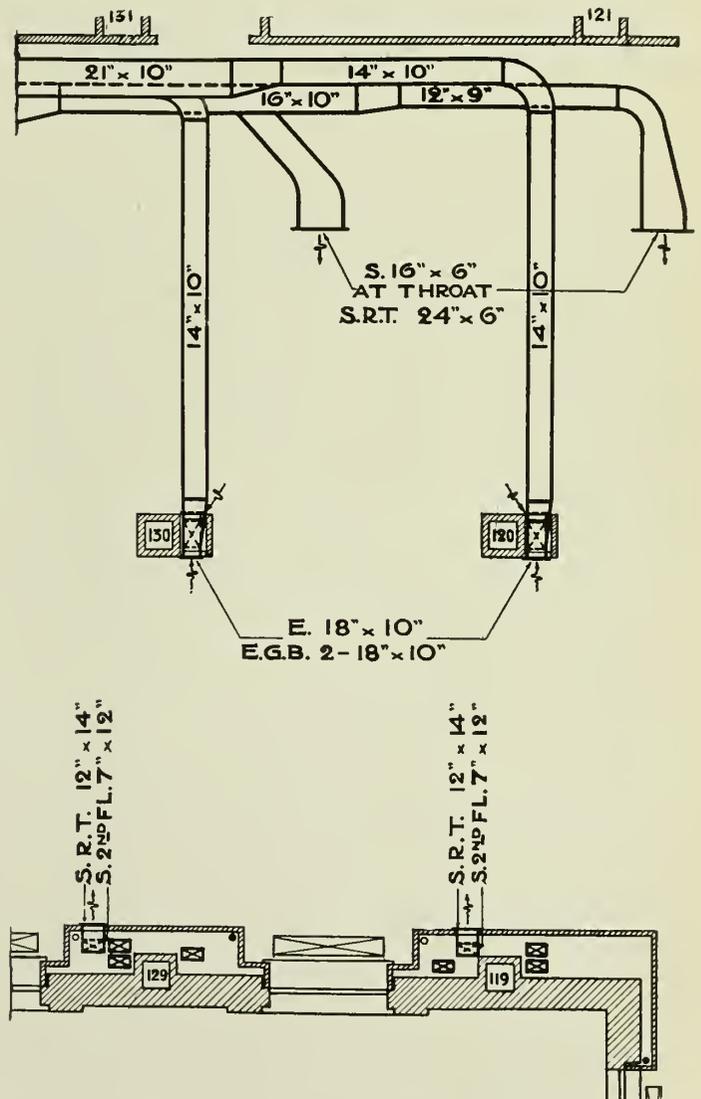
Part Plan of Typical Floor. Lower Zone.
